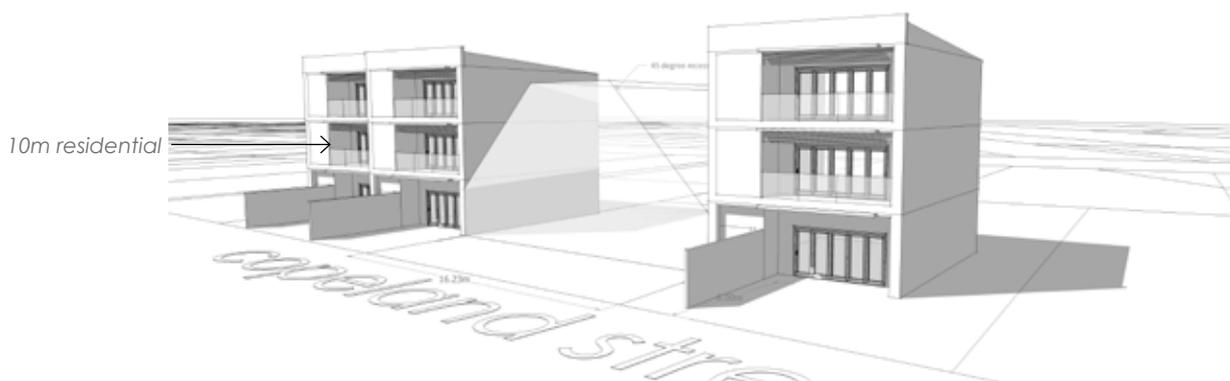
EXISTING RECESSION PLANES WITH THE REMOVAL OF THE STREET FRONTAGE RECESSION PLANE
